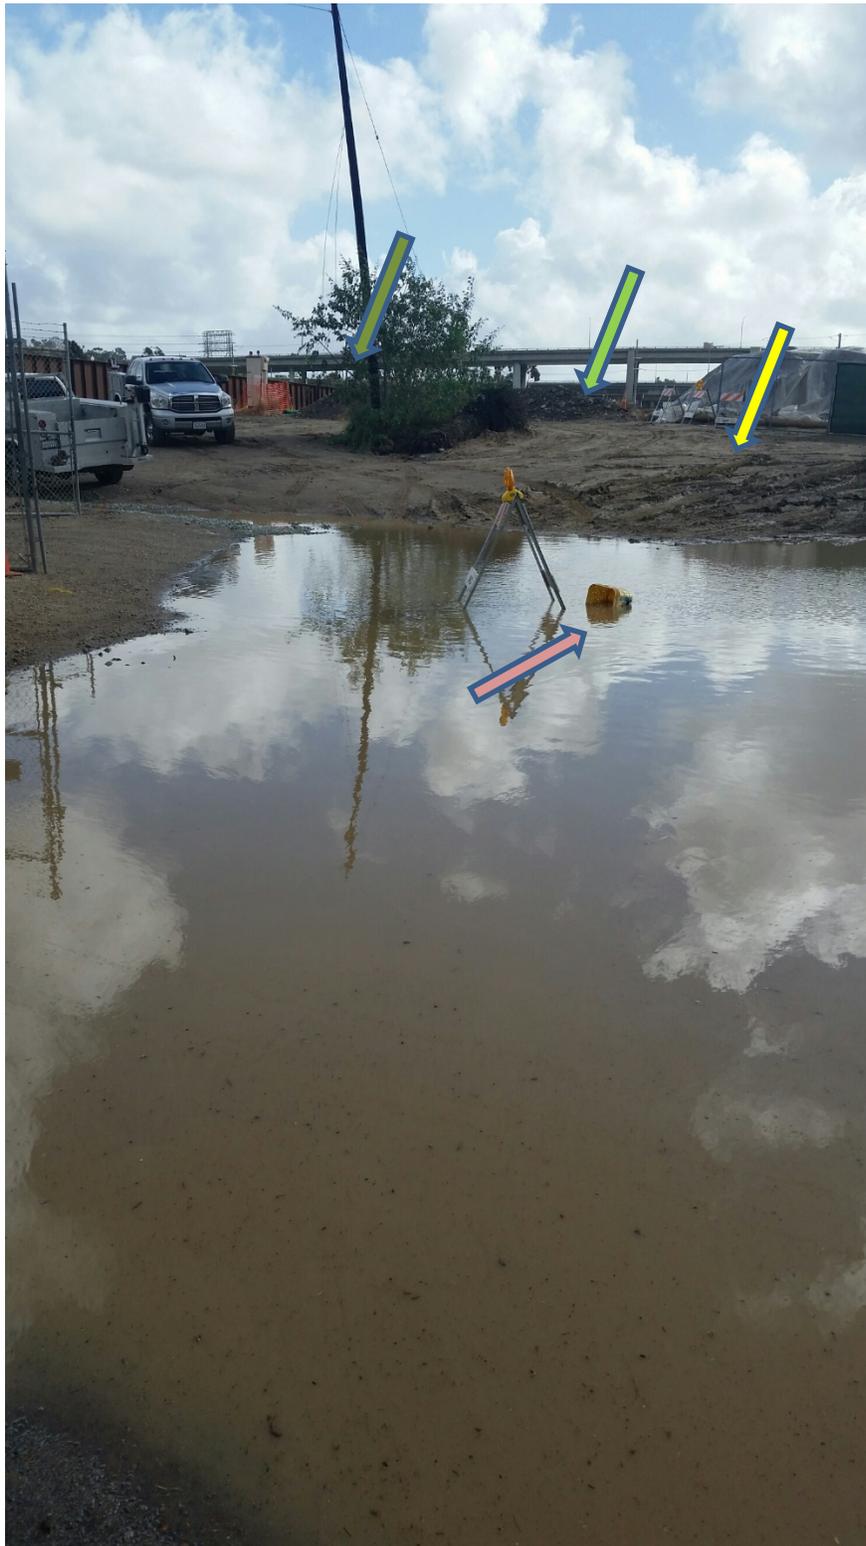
shows a lack of perimeter sediment controls, a lack of stockpile BMPs (green arrows), erosion controls (yellow arrow). Photo 10 shows the impounded storm water on the construction site with the pump in center (pink arrow).
